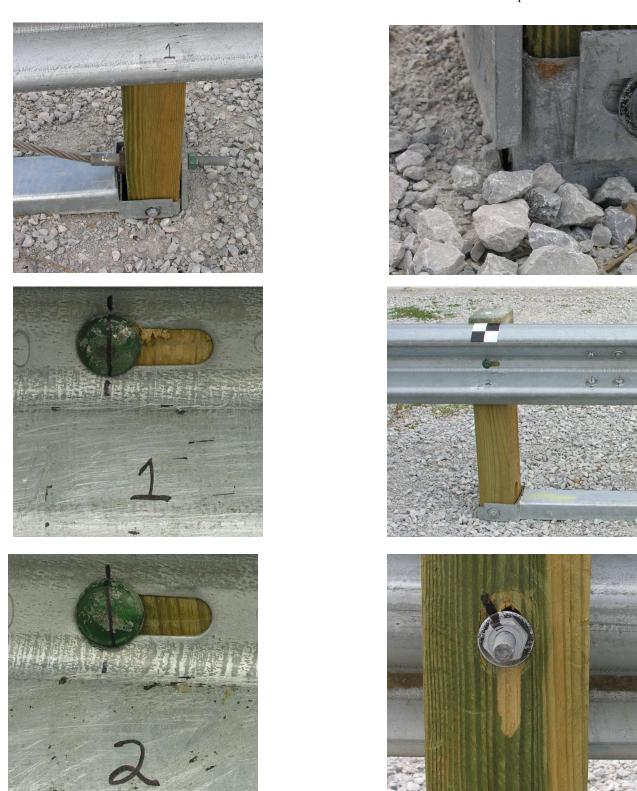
Upstream Anchor Damage, Test No. MGSSYP-2
